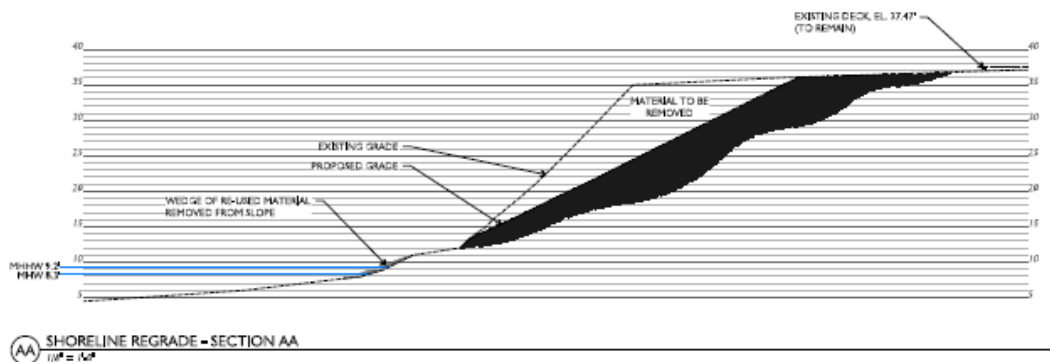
INSET SHOWS A CROSS-SECTION OF GRADED AREA AT SECTION AA OF SITE PLAN.
